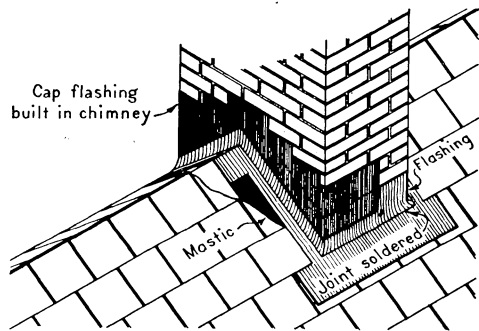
The cap flashing is built into the joints when the masonry is laid and is folded down at least 4 inches over the base flashing that is installed when the roofing is placed.
